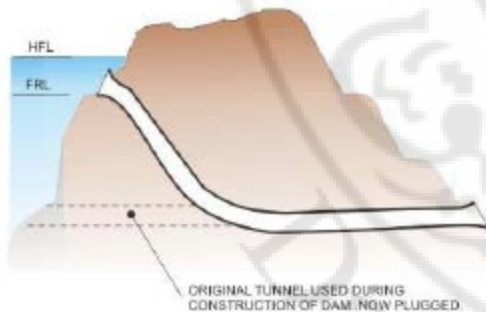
Bell mouth entry to a tunnel spillway (Gate control at entrance not shown)
